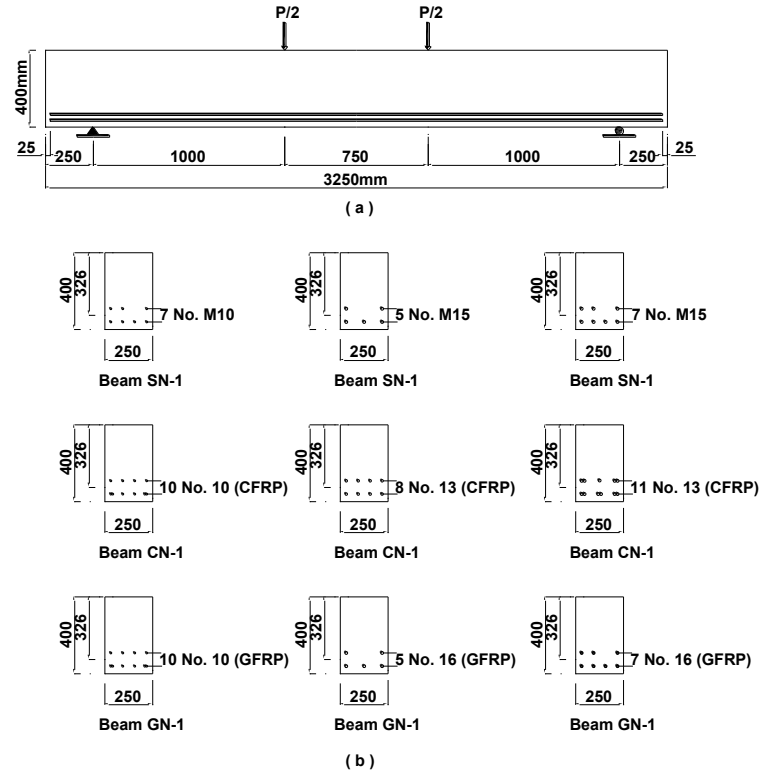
(a) Test setup and dimensions; and (b) Sectional details. El-Sayed et al. [2006a]
